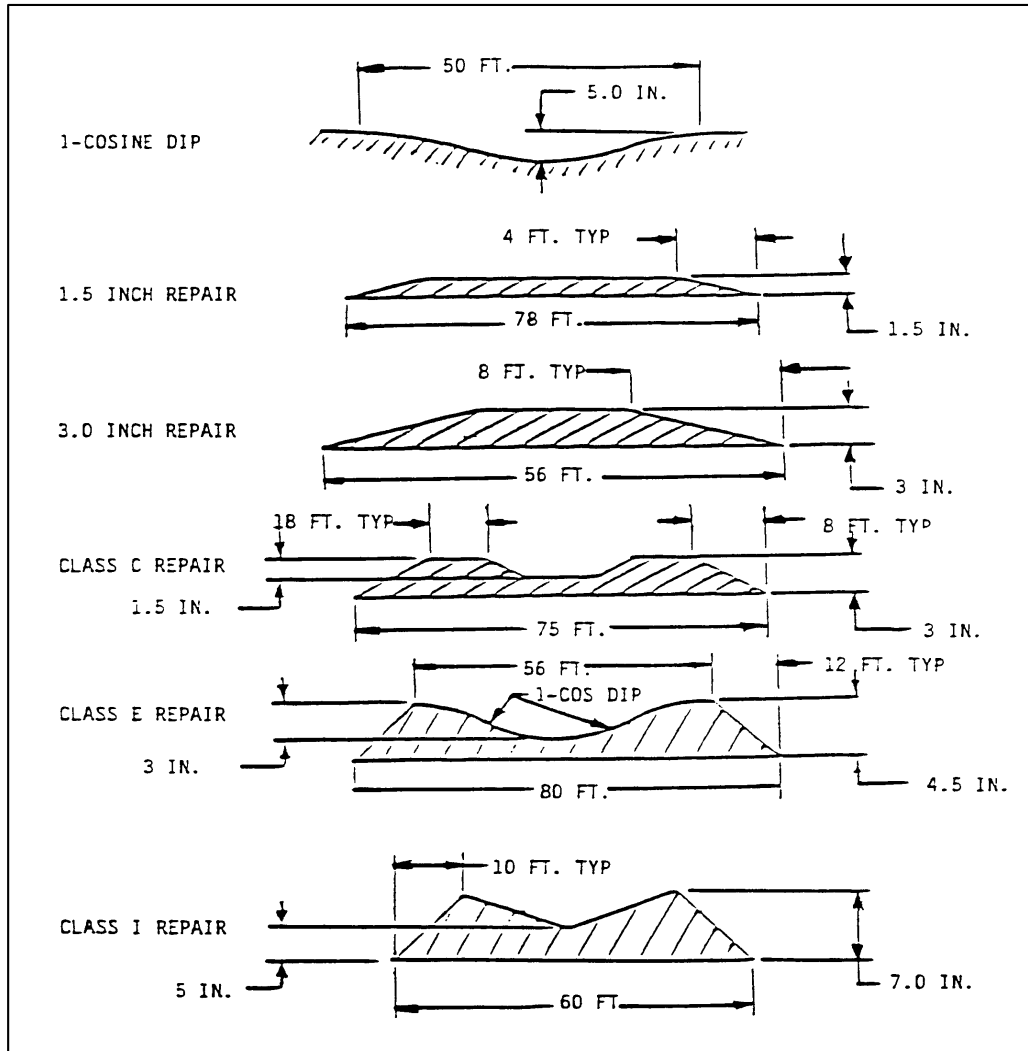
Typical Runway Repair Landing Gear Testing Profiles
